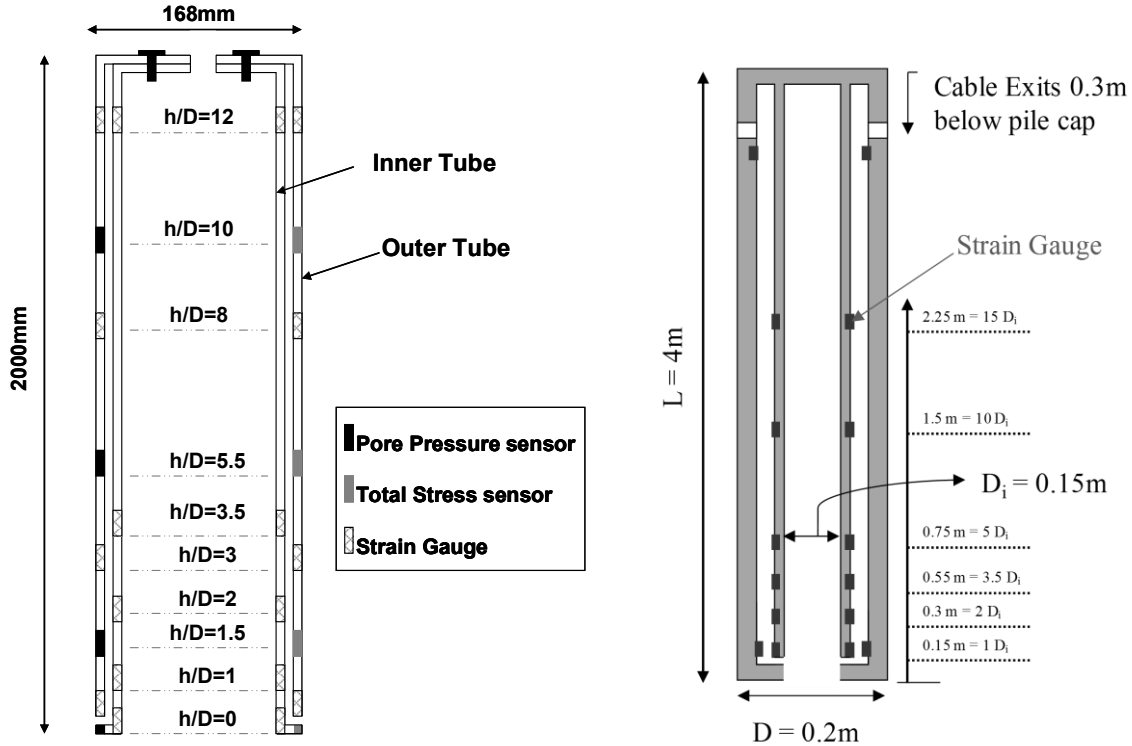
Open-ended pile constructions and instrumentation layouts: (a) UCD model pile (Igoe et al., 2010a, b); (b) Mortarstown pile (IP-240).
